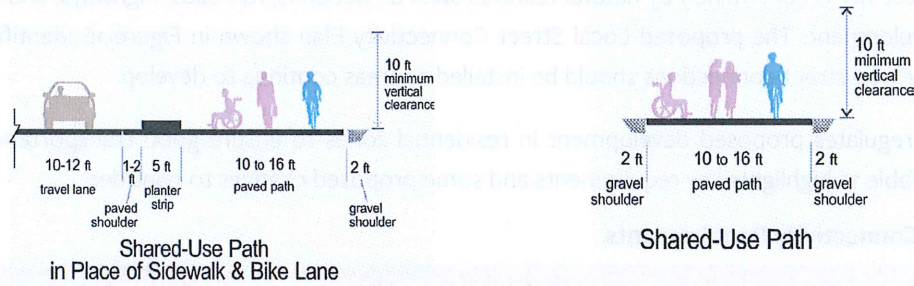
Proposed Shared-Use Path Typical Cross-Section Standards and Alternative Minimum Standards
